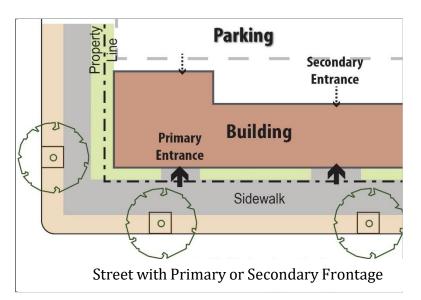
Figure showing required building orientation and location of primary entrances Figure 6.4 Figure Showing Required Building Orientation and Location of Primary Entrances
